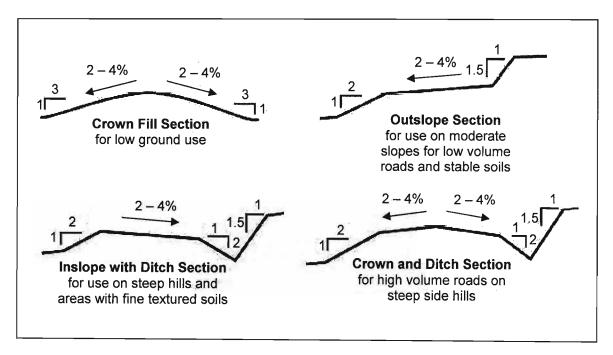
Forest road cross-sections dependant on drainage needs, soil stability, slope, and expected traffic volume. Arrows indicate percent slope and direction of surface water flow (Adapted from Anon, 2002)
